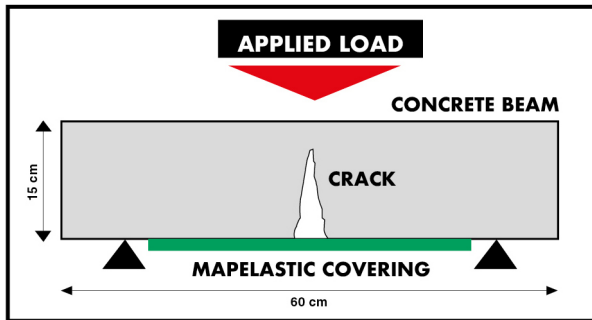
Protection of a hairline crack with Mapelastic on the outside of a concrete beam subject to flexural stress
